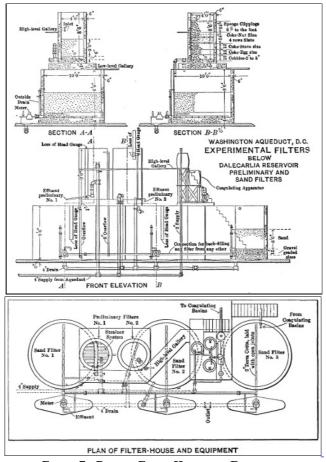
PLAN OF FILTER-HOUSE AND EQUIPMENT.
